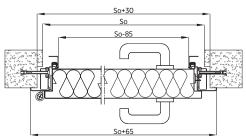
Installation of a single-leaf door to a masonry wall – corner frame with a thermal break – horizontal cross-section
